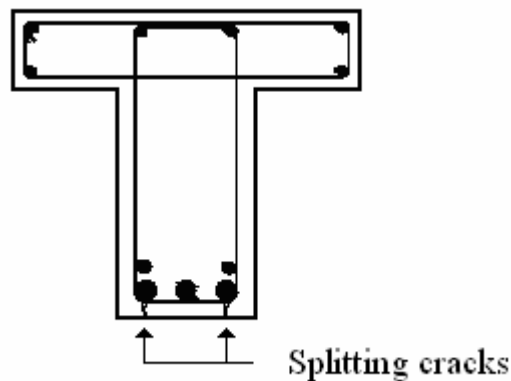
Cross-section of the tested beams and location of splitting cracks.
